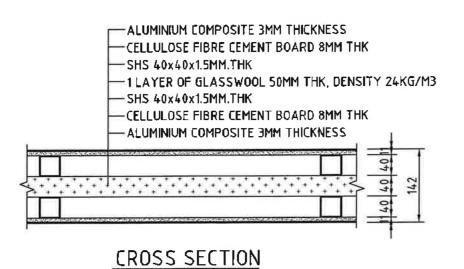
DETAIL OF WALL TYPE 1 INSIDE BATHROOM (TYPICAL)
